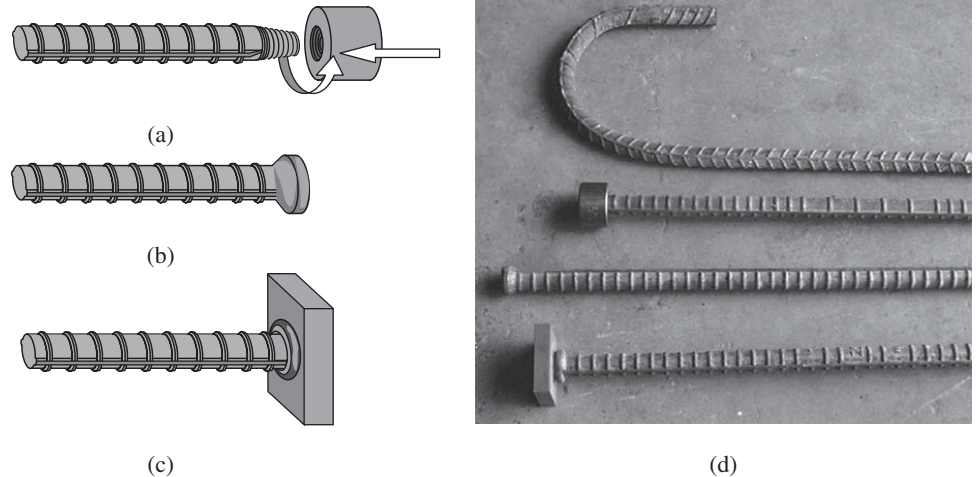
Types of heads and various headed bars compared to a standard hook (25 mm size) (a) Threaded head (b) Forged head (c) Friction welded head (d) Photo showing bars with standard hook and various heads
